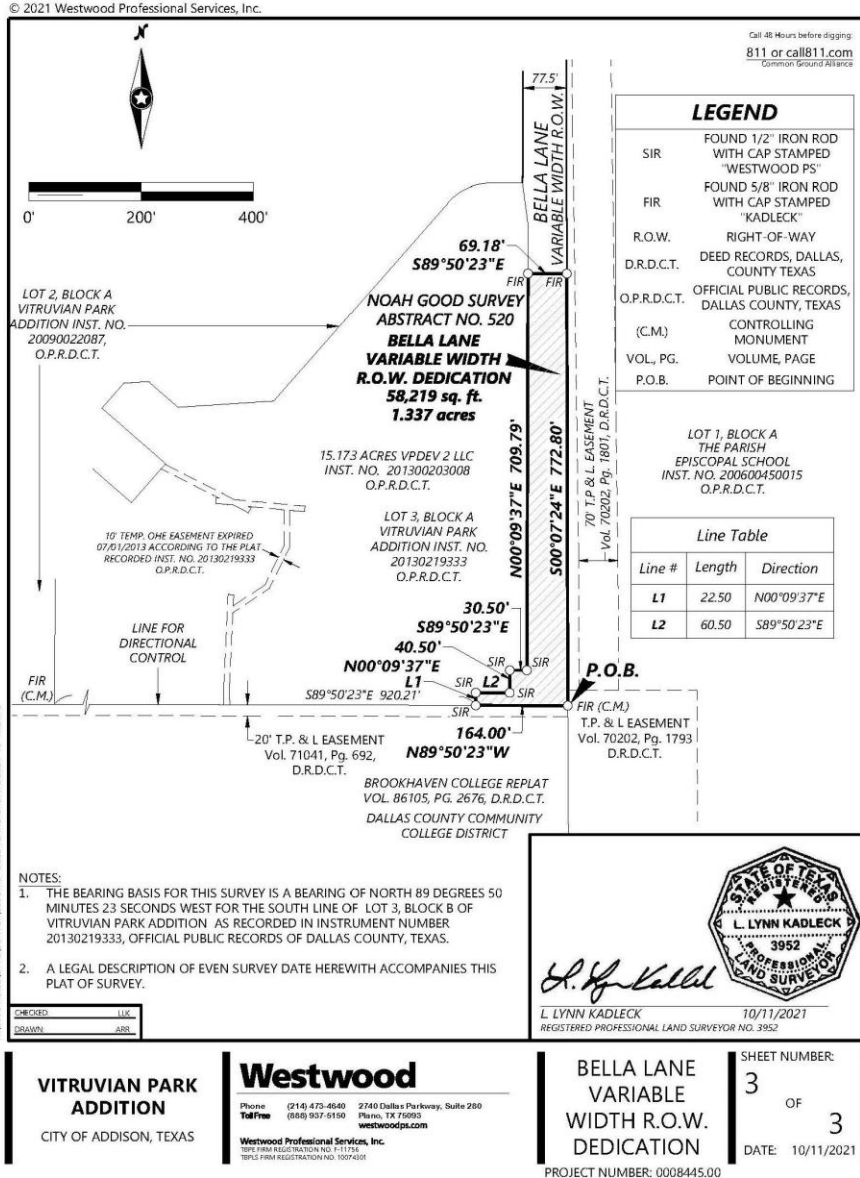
EXHIBIT B TO PUBLIC STREET RIGHT OF WAY AND GENERAL UTILITY EASEMENT
